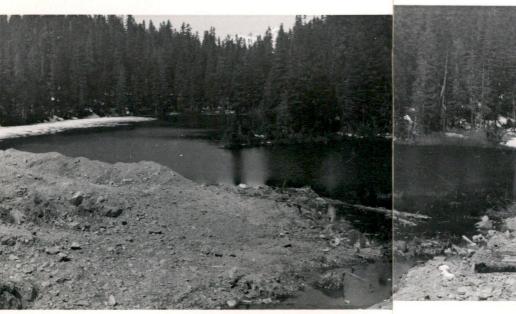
NORTHAIR MINES LTD. JULY, 1975 TAILINGS IMPOUNDMENT BEFORE CONSTRUCTION
